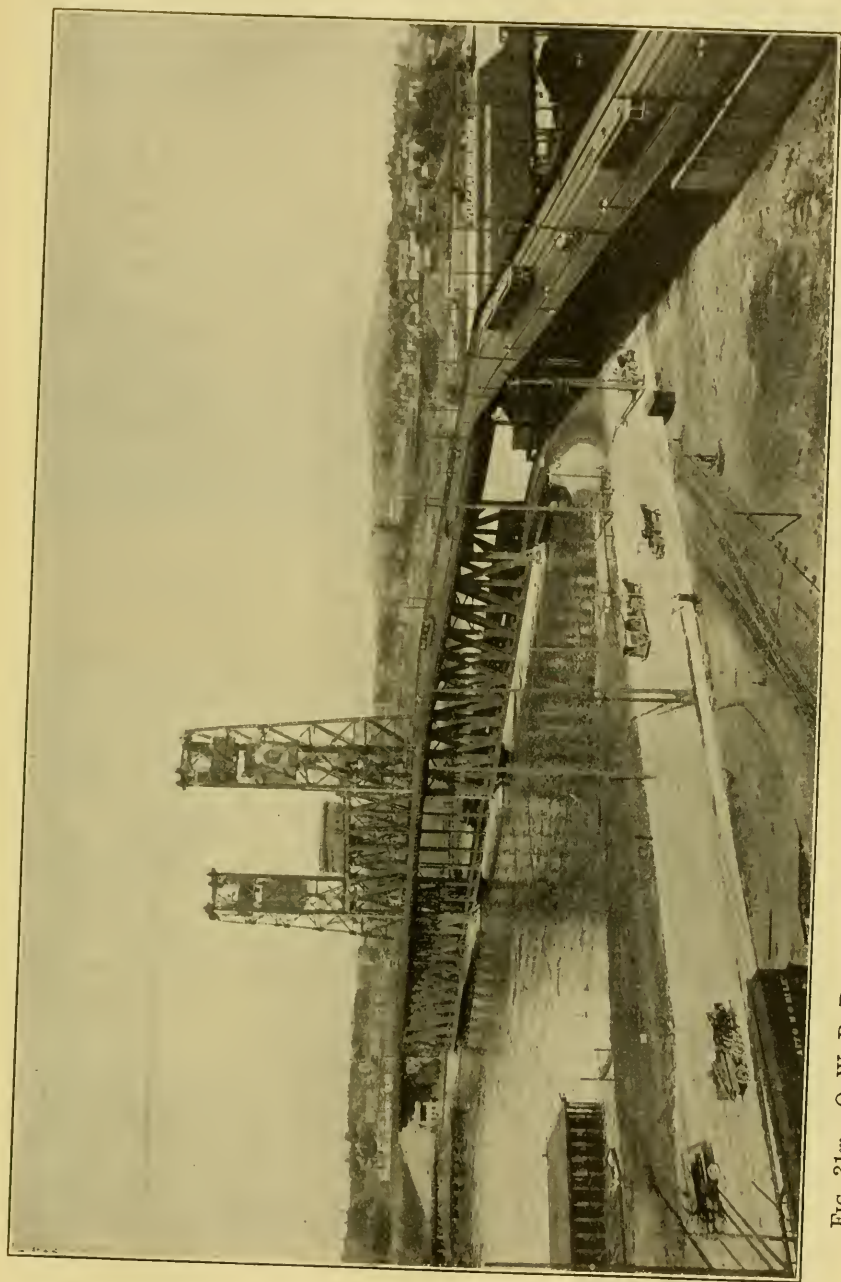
O.-W. R. R. and N. Co.'s Bridge over the Willamette River at Portland, Ore., with the Approaches.
